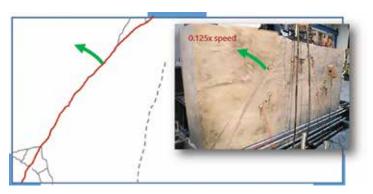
Failure crack pattern and image of instant of failure for specimen Re-45-Ex
